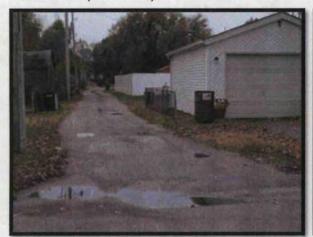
Alley at McKinley Street and Brown Street (view north).
